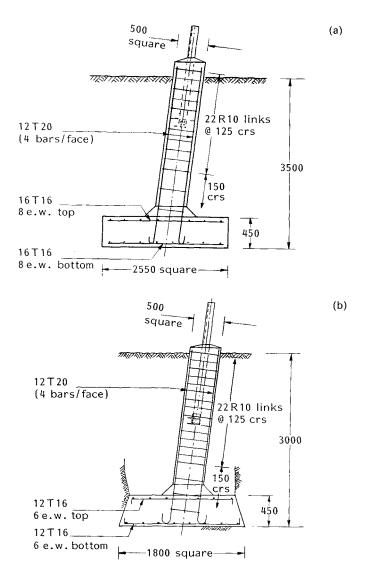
(a) Standard pad foundation; (b) undercut pad foundation
